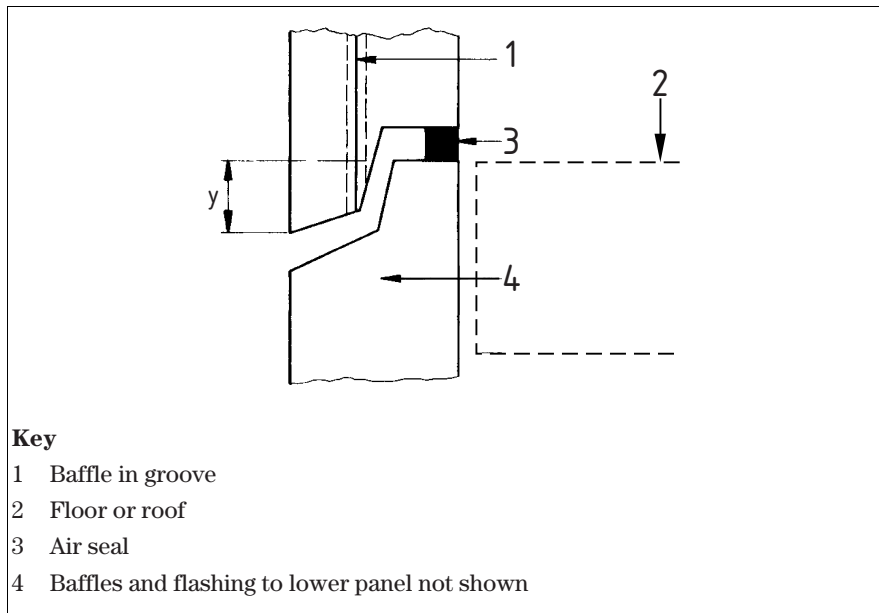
Diagram showing top of baffle in a two-stage horizontal joint: section at horizontal/vertical joint intersection
